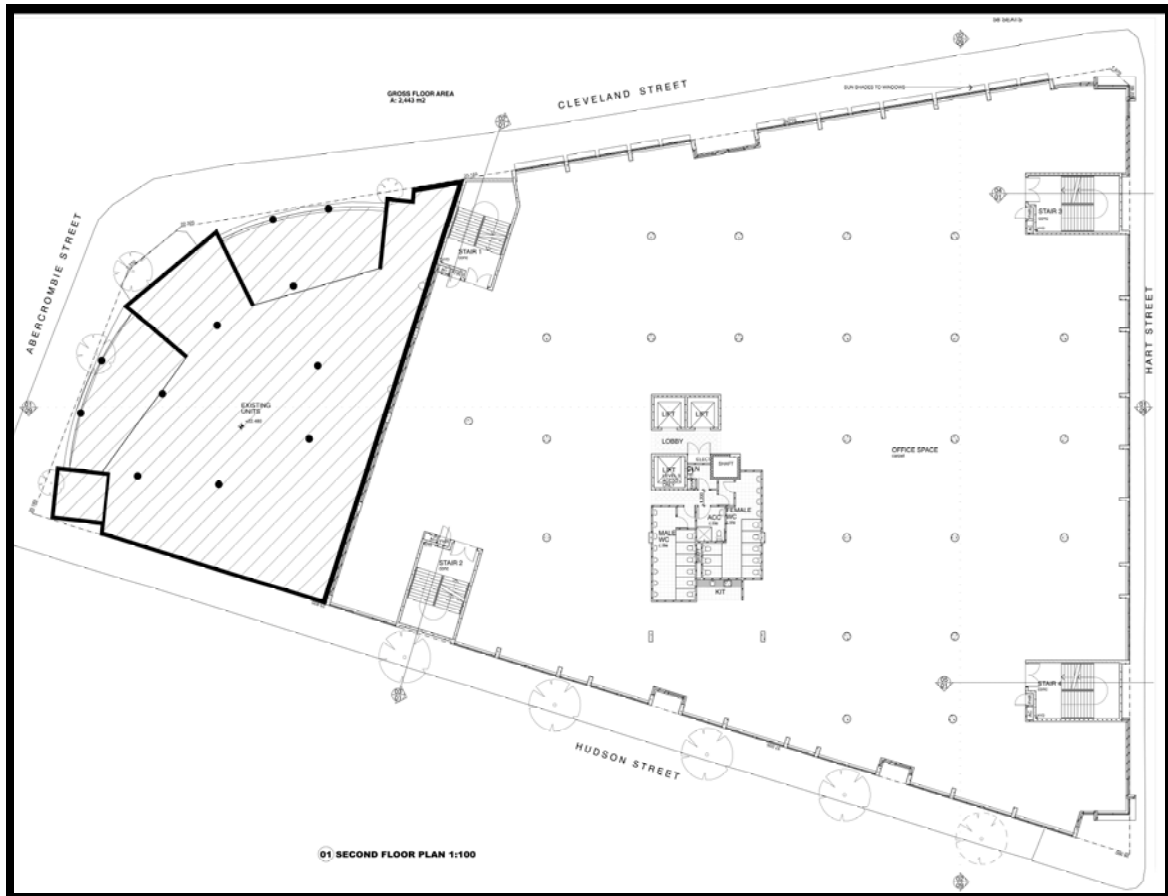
Second floor plan of proposed development (not to scale). (Source: Fortey + Grant Architecture, 2010)
